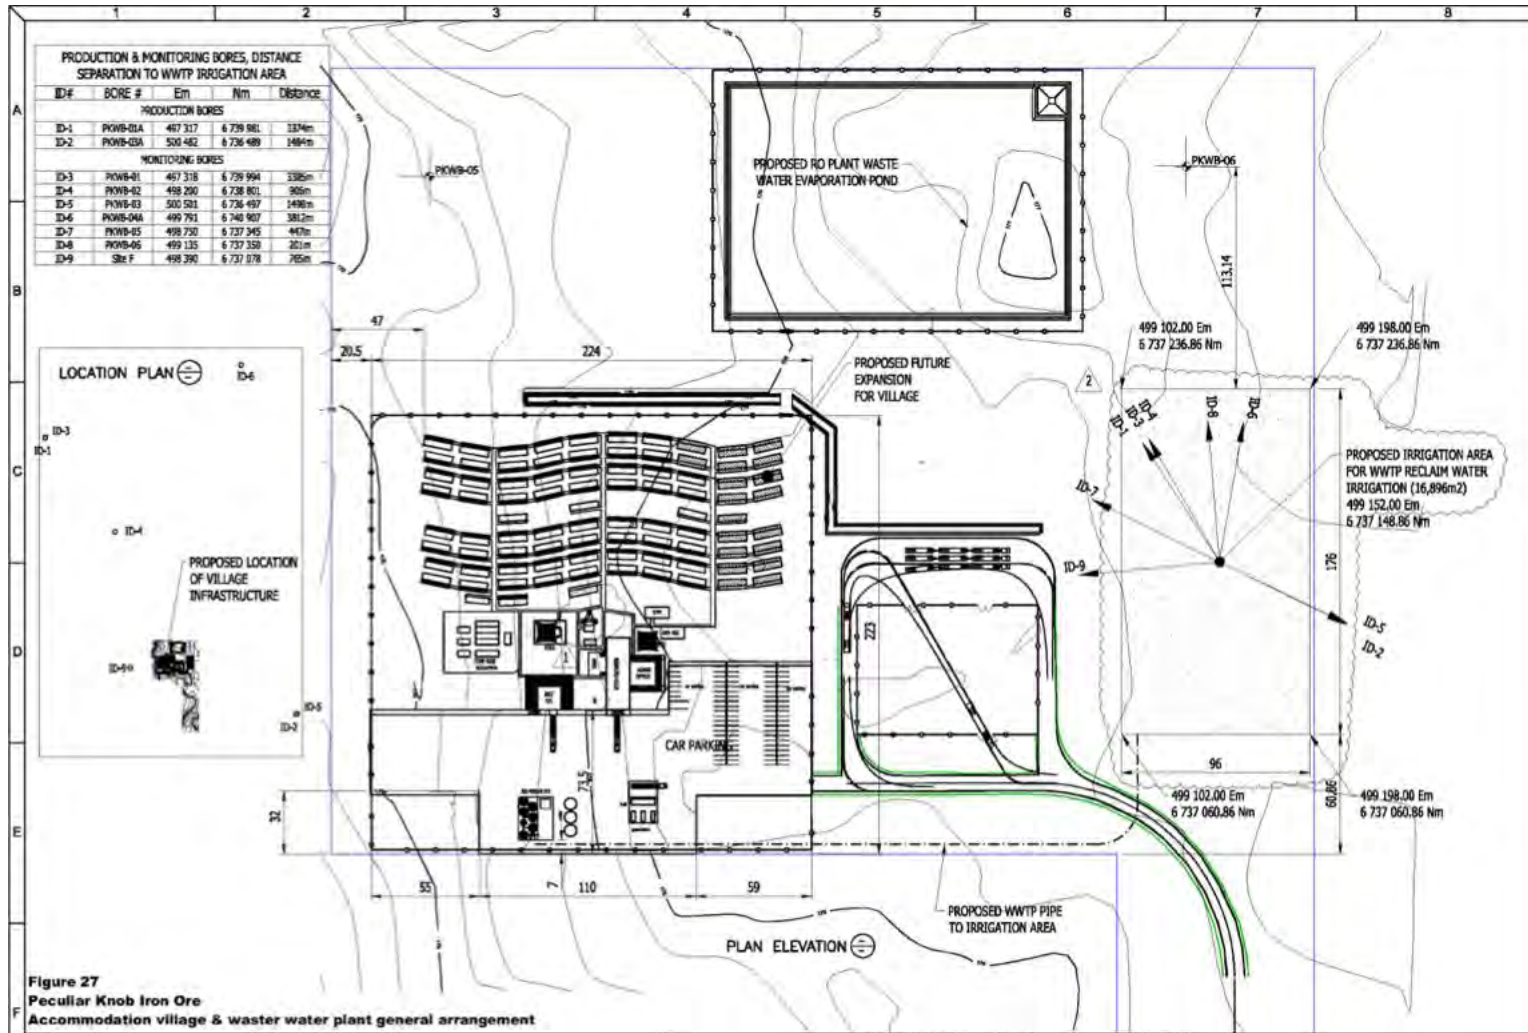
Indicative details of the optional accommodation village and wastewater plant layout
